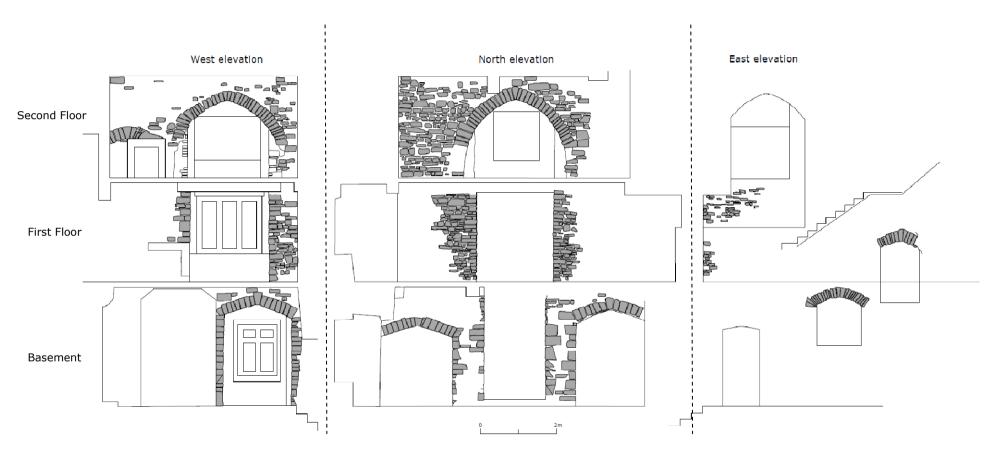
Elevation drawings showing west, north and east elevations of northern end of D-Shaped Tower for Basement, First and Second Floors
